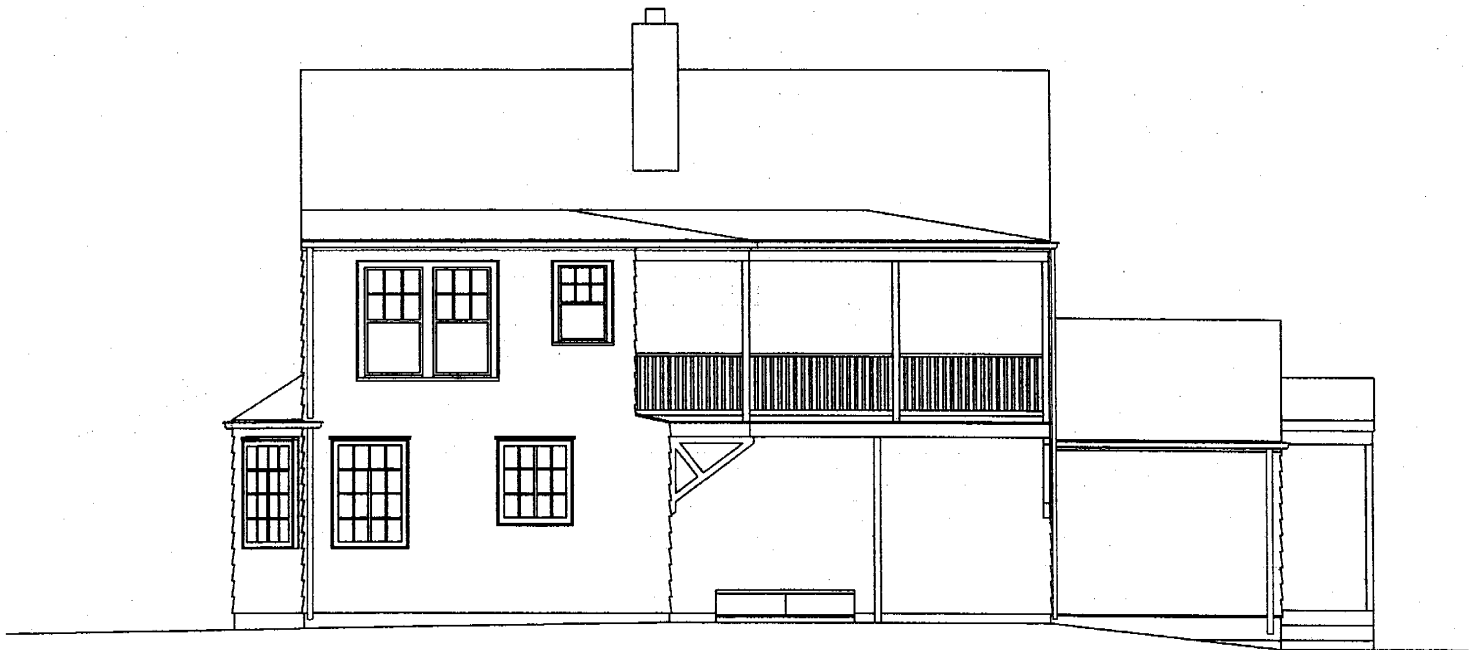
Rear (East) Elevation. The two-storey addition and the bay and the left, as well as the second floor porch are all additions from the late 1930's. *Drawing by Jason Gagen, copyright 2004 by Brenneman & Pagenstecher, Inc.
